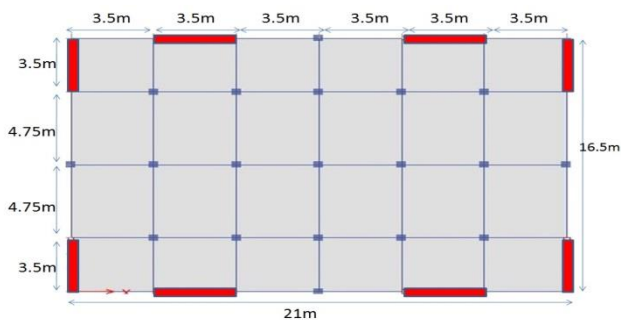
Plan of the building model with 1% shear wall ratio in each direction
